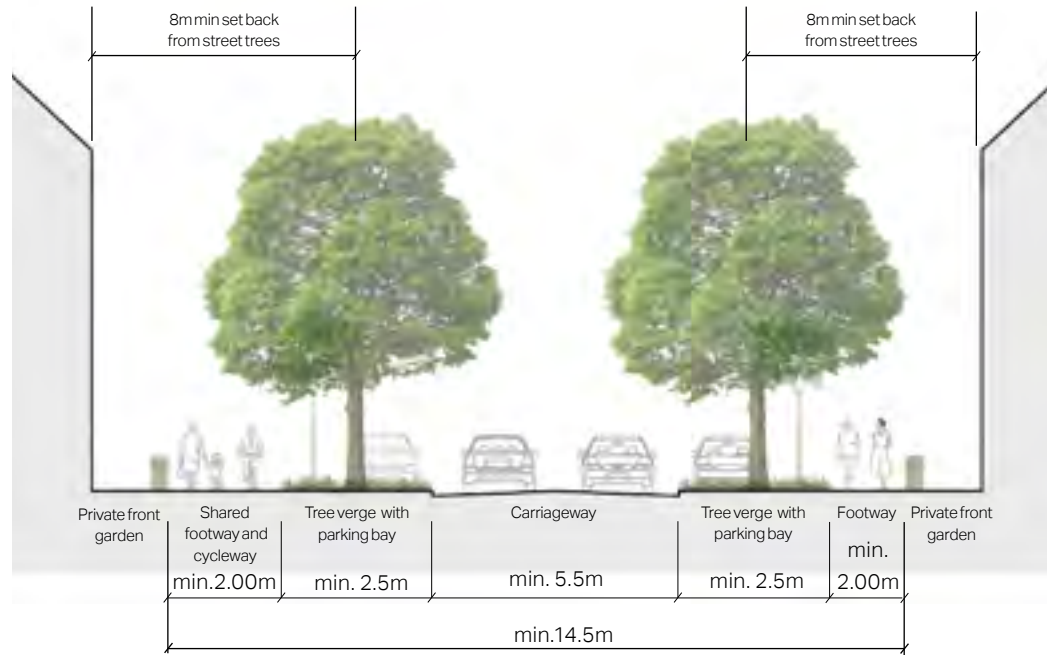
Cross-section to illustrate some dimensions for primary streets.
